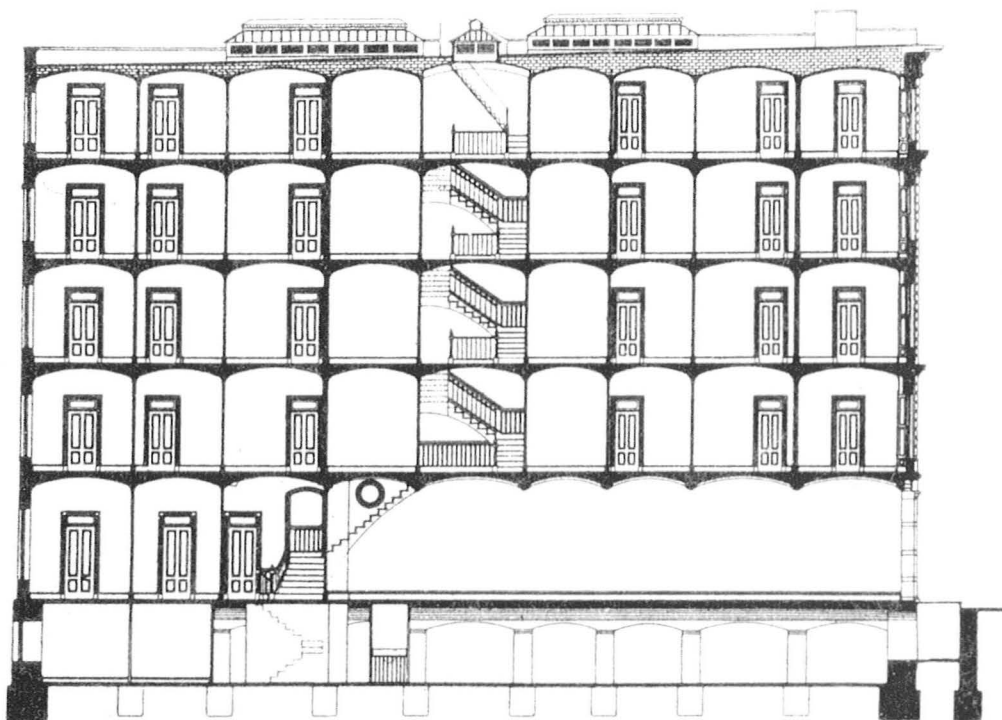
FIRE-PROOF TENEMENT HOUSE, NEW YORK CITY.
